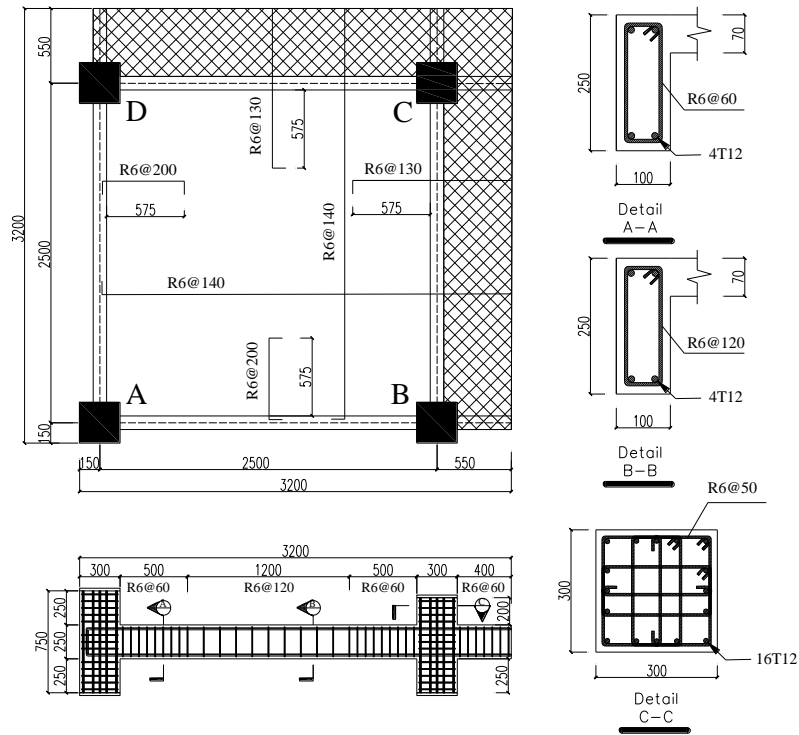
Dimensions of Specimen US (units: mm) [5]
